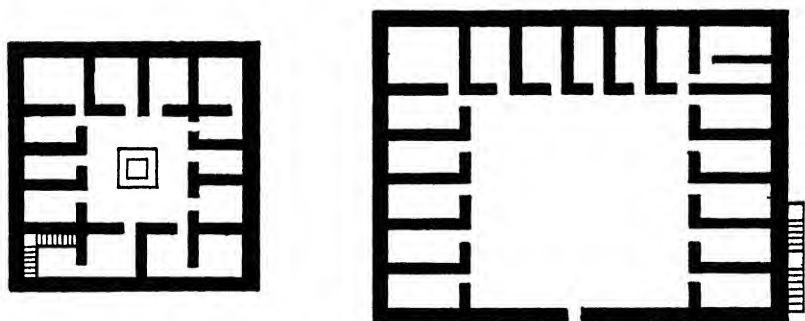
HOUSE PLANS OF THEBES, EGYPT
